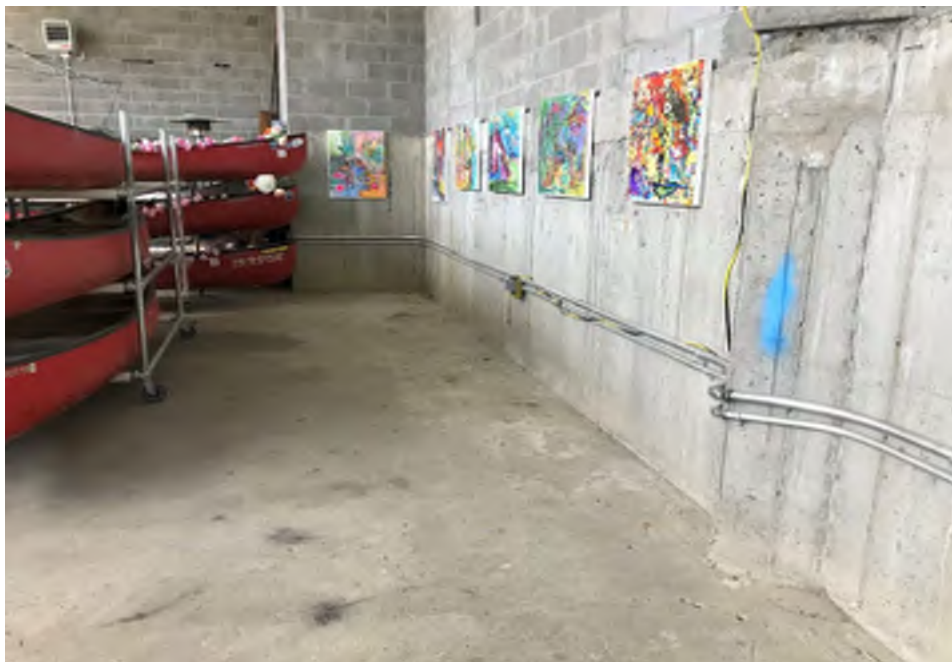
Subgrade parking garage concrete slab, facing southeast. 30 March 2021.
